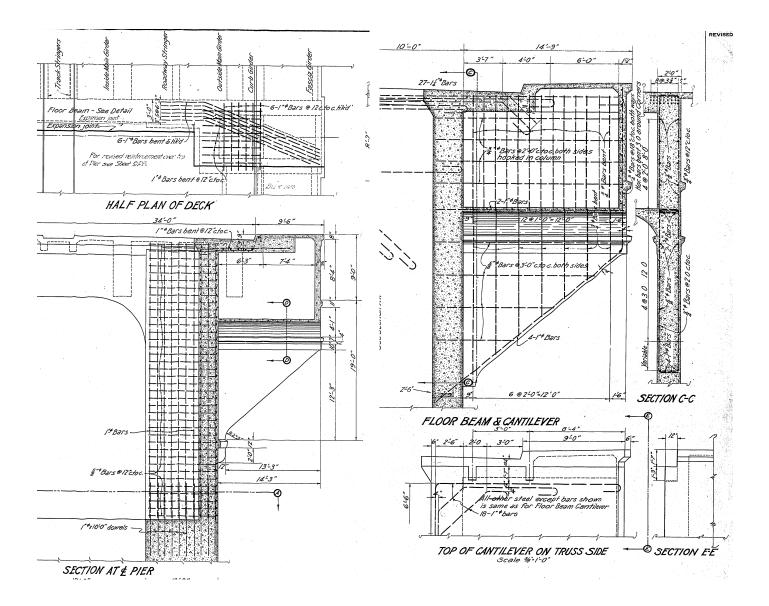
Burnside Bridge Approach Span Deck Tie to Piers 1 & 4
